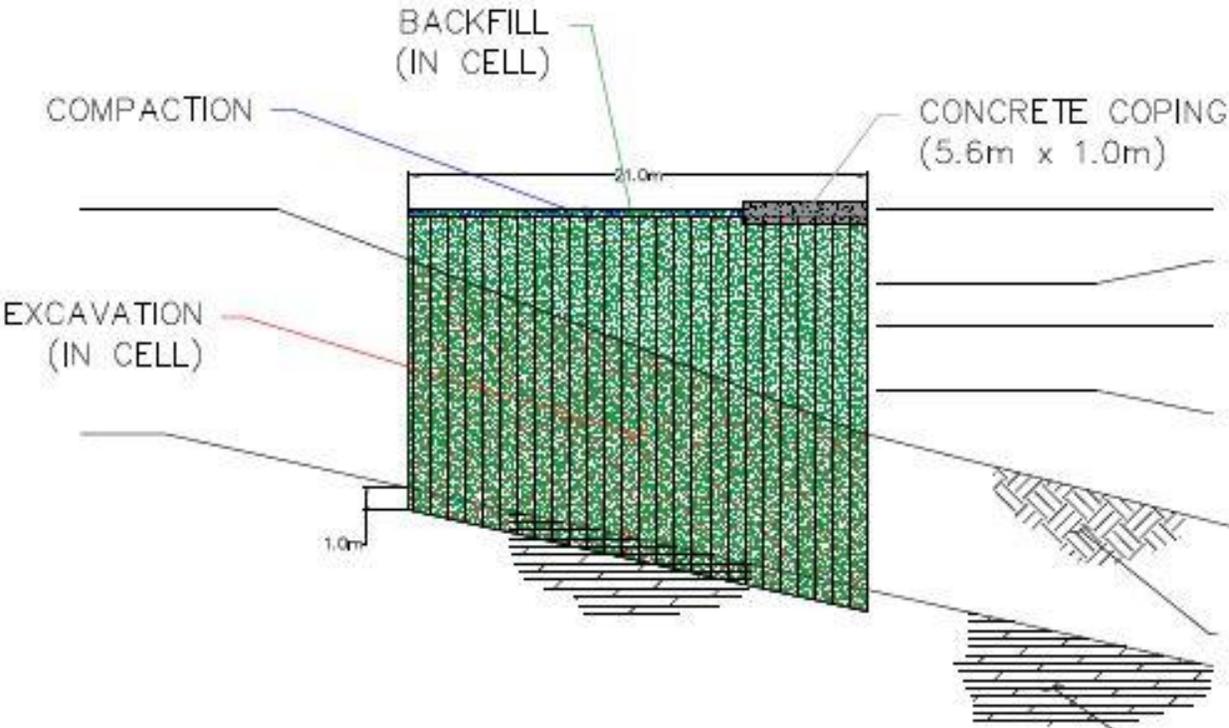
Cross Section of Sheet Pile Circular Wall
